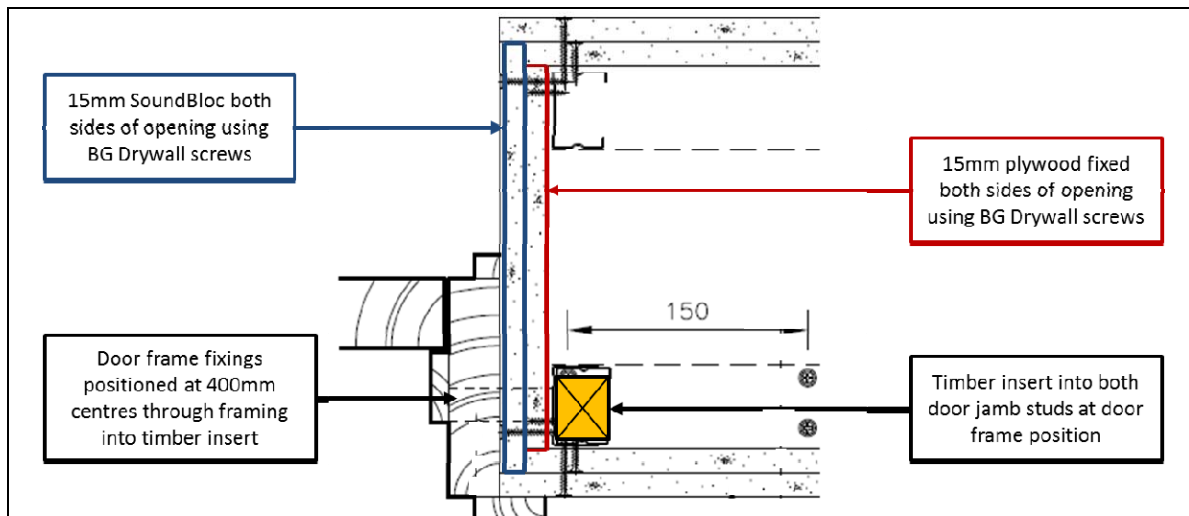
Horizontal cross section view of the door opening in the proposed partitions
